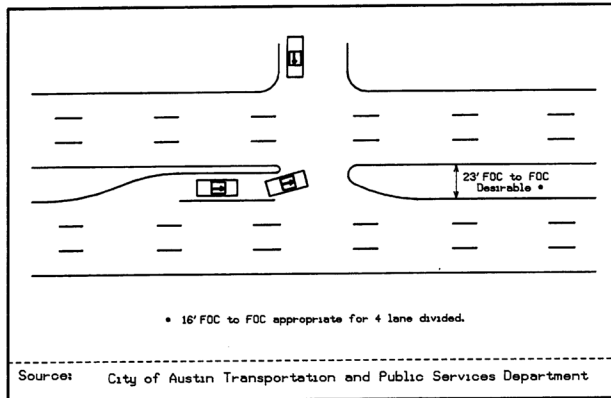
Typical Median Application for Providing Crossing Vehicle Protection from a Driveway or Cross-Street
